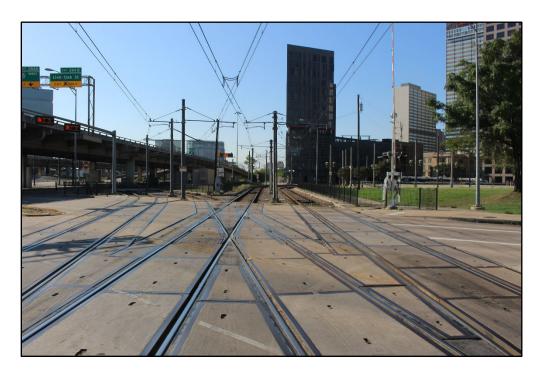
Looking north from east of I-345 at the existing I-345 mainlanes that are proposed to be depressed as part of the reconstruction.
